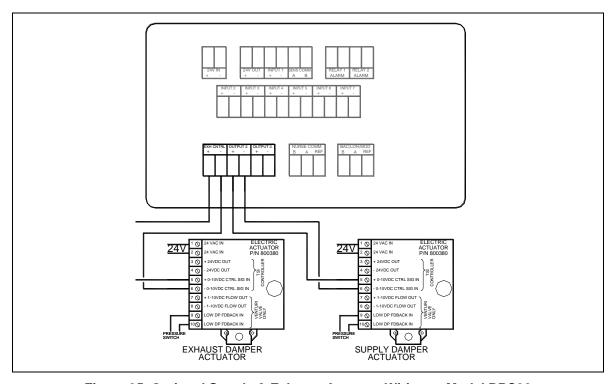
Optional Supply & Exhaust Actuator Wiring to Model RPC30
